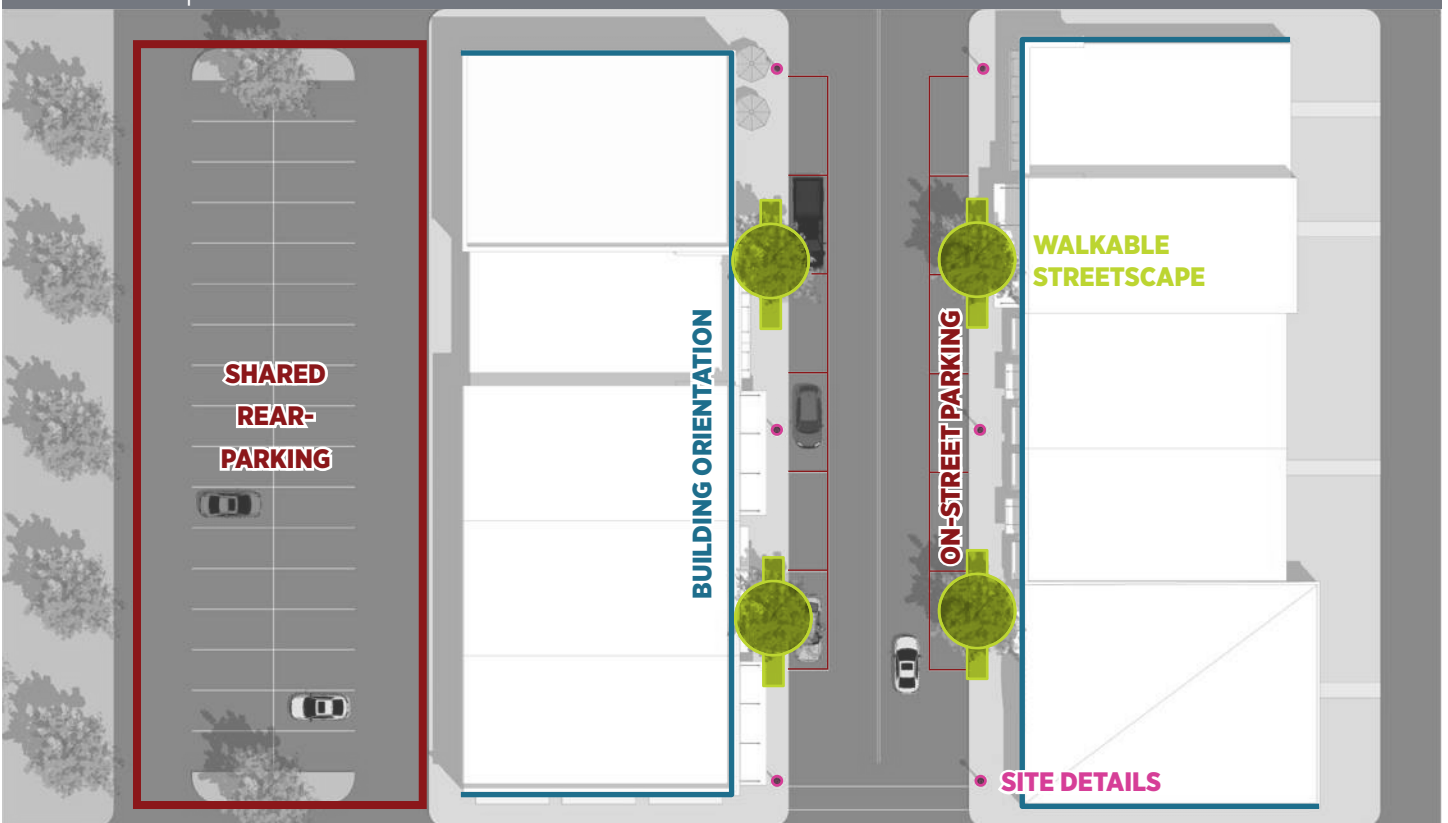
| HD CMU SITES - COMPOSITION PLAN VIEW
